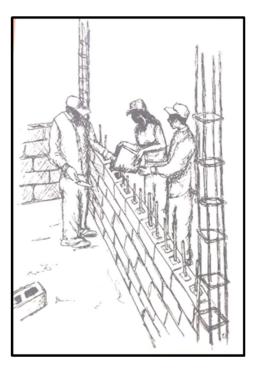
Concrete block over vertical rebar installation (Mihelcic 2009).
